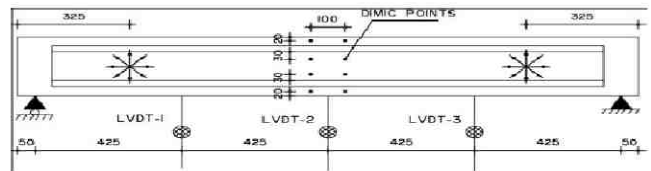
LOCATION OF DIMIC POINTS AND LVDT IN A TYPICAL BEAM.
